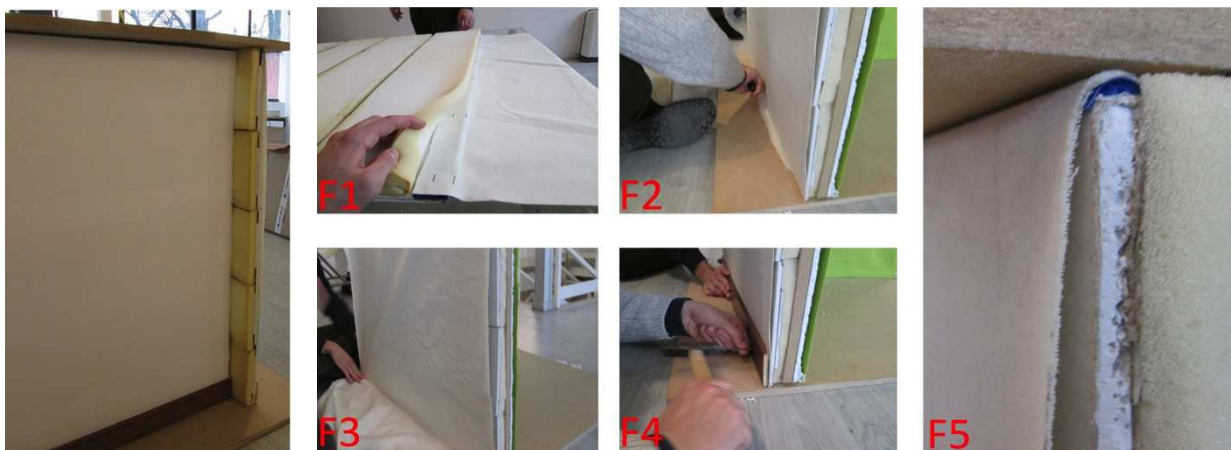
a) Back view of the assembled system, b) Fixing details of the textile finishing.
